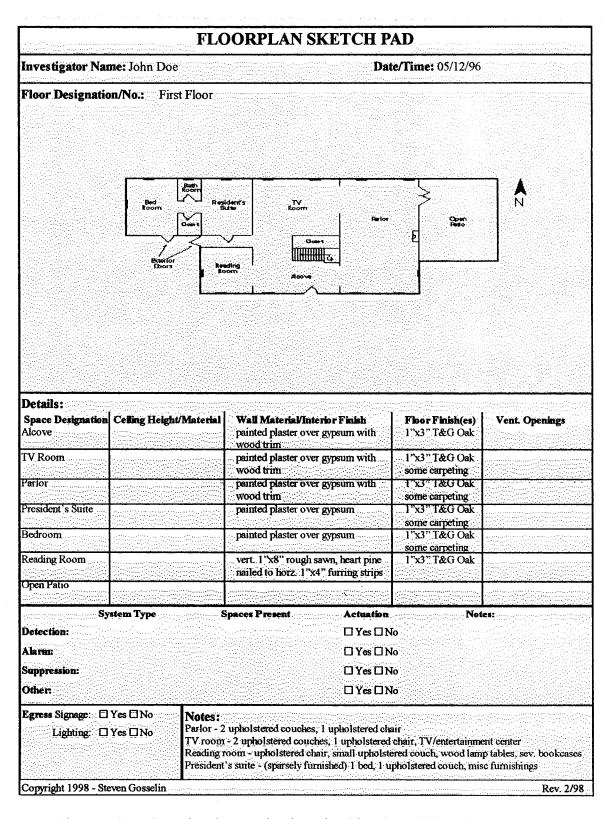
B – Completed example Floorplan Sketch Pad (Sketch ©NFPA Fire Investigations Department. Used with permission. 78)
